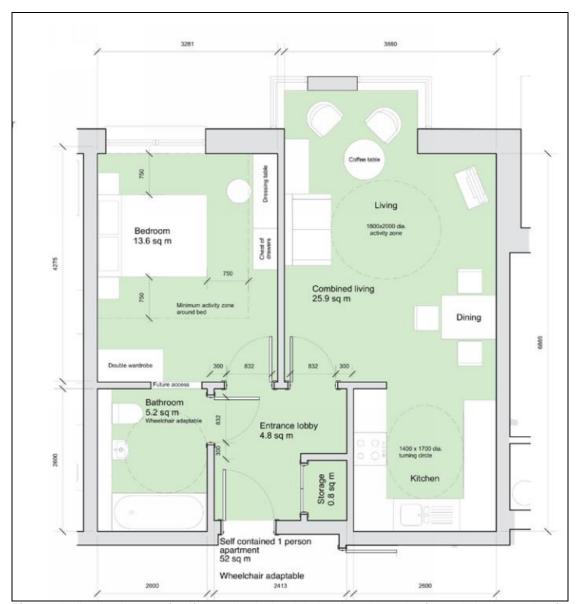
Indicative layout of self-contained wheelchair adaptable units (two will be located at first floor level and three will be located at second floor level).
